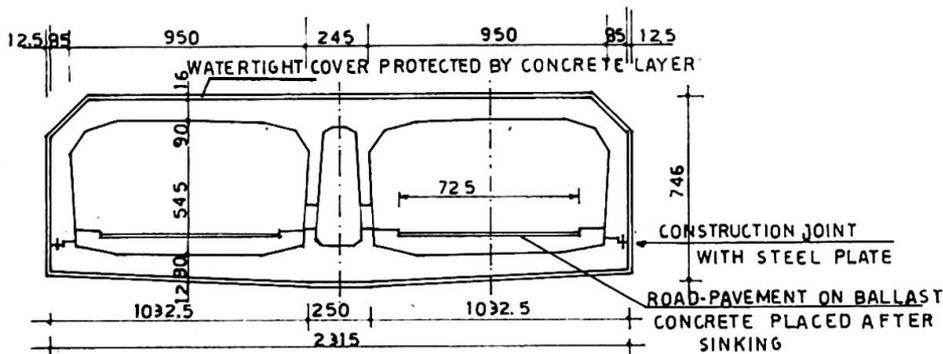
Cross-section of highway tunnel element Amsterdam.
